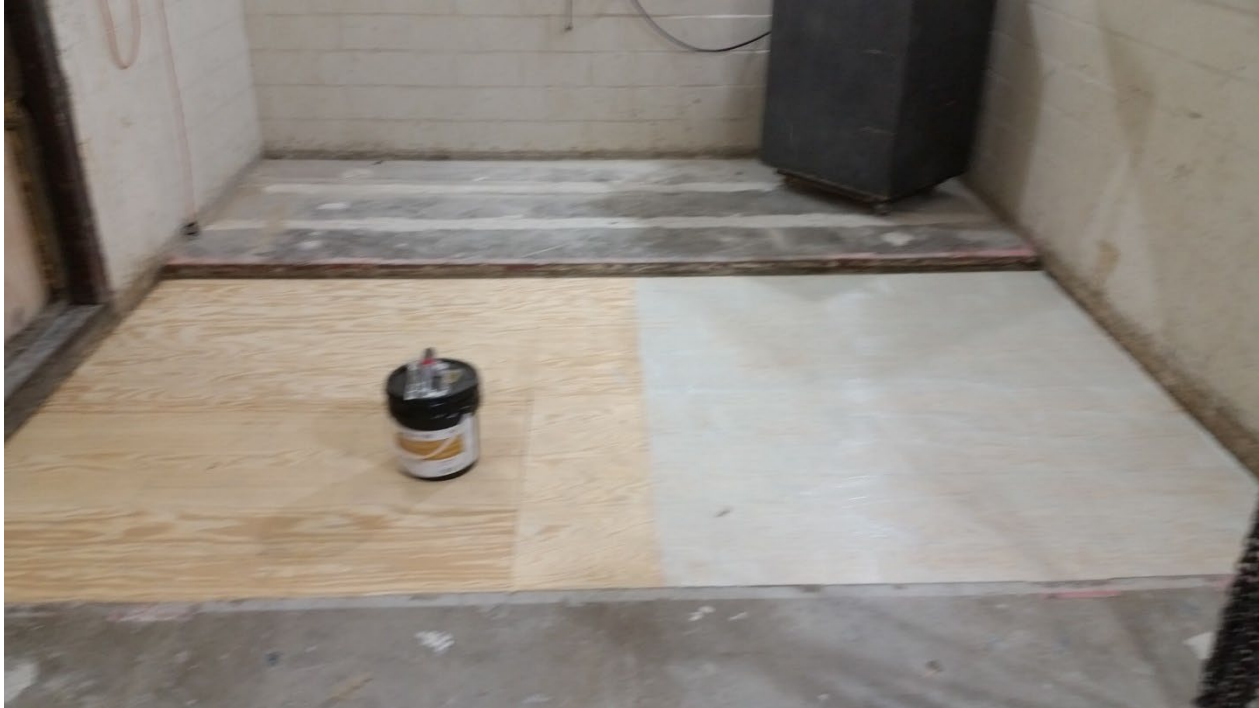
Plywood subfloor installed, adhesive partially installed over plywood
